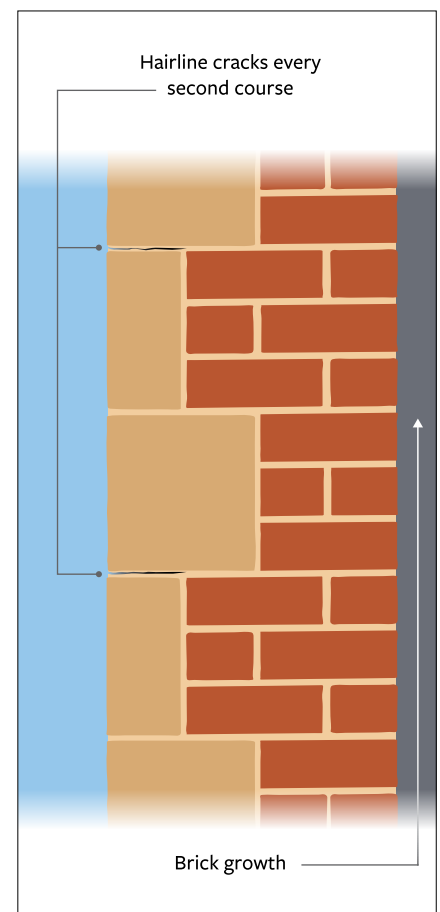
Brick growth. In this sectional view of a composite wall, brick growth has lifted the stones, producing a hairline crack at every second bed joint.
